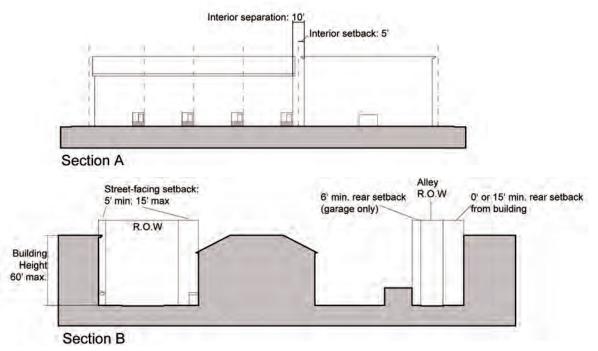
Mixed Use Area Buildings without Storefront Section Diagram
